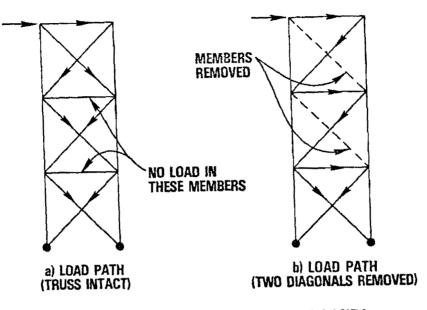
THE ROLE OF HORIZONTALS IN PROVIDING ALTERNATIVE LOAD PATHS IN A DAMAGED X-BRACED TRUSS
